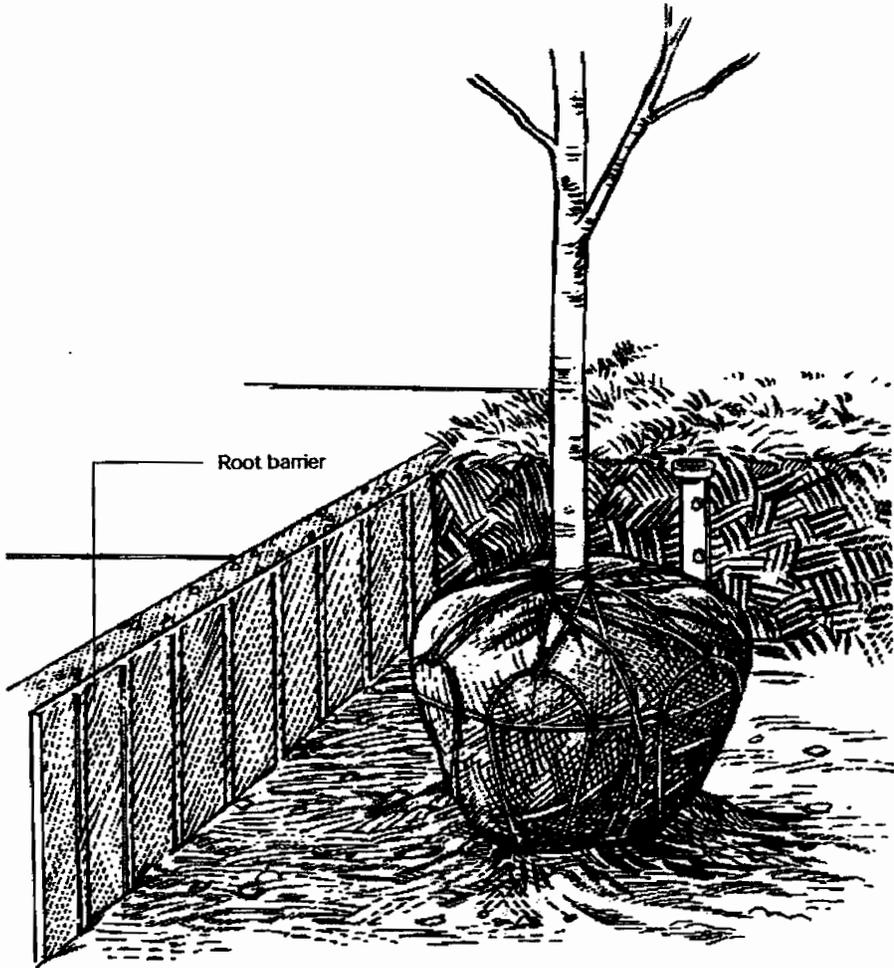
Structural soils in continuous planters, under sidewalks, and under asphalt allow tree roots to grow while supporting the weight of cement and asphalt. The actual planting pit is filled with fertile soil.
